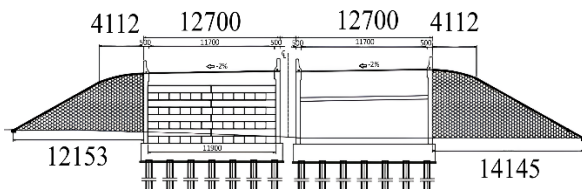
Cross section of the EPS Embankment and Instrumentation at Abutment of the Trans Sumatra Toll Road Project Simpang Indralaya – Prabumulih Zone 6 STA 59 + 425
